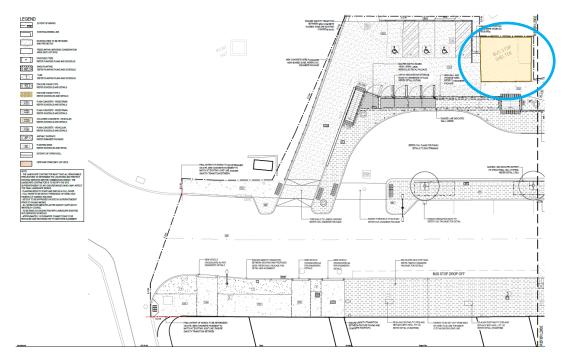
Extract of General Arrangement Sheet 1, showing the extent of the proposed works. The former tram shed is indicated in blue (Source: Group GSA, General Arrangement Sheet 1, L2001 F 19/10/2018).
